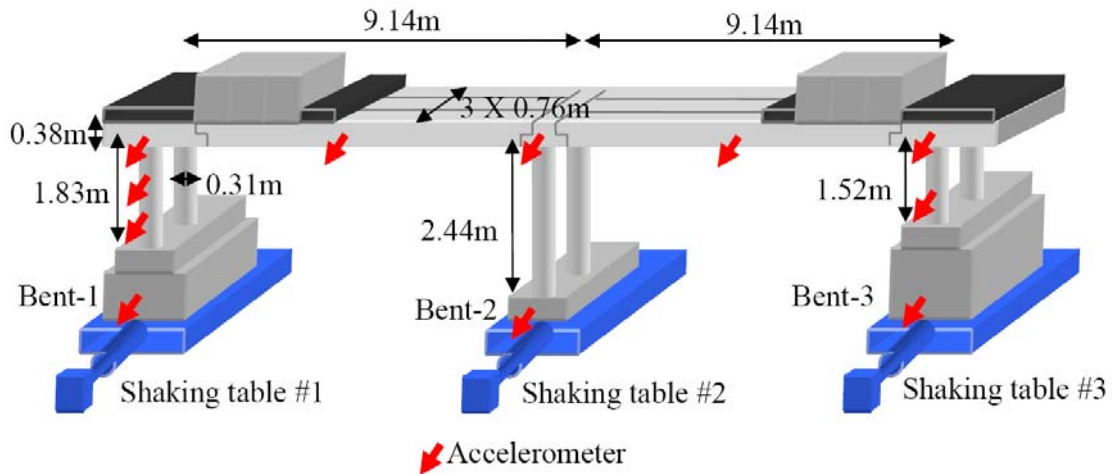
Schematic View of the Bridge Model and Sensor Layout
